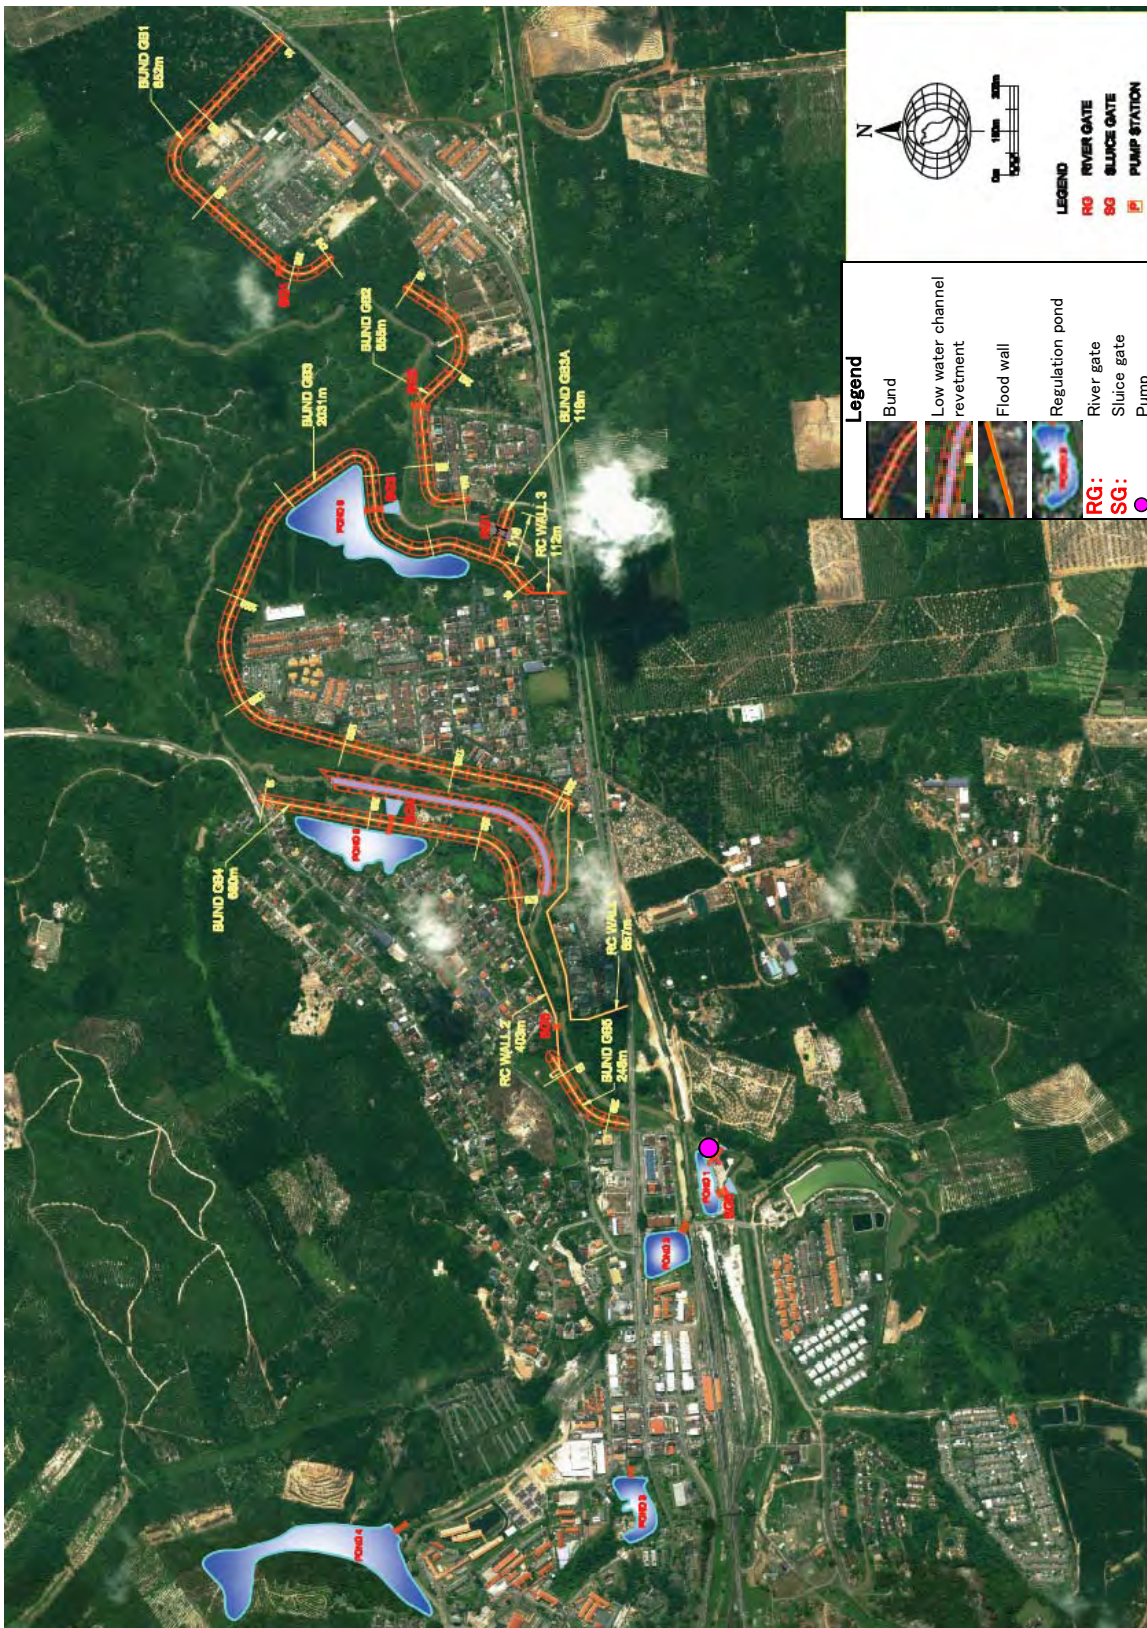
Plan of Structural Measures for Alternative-1
